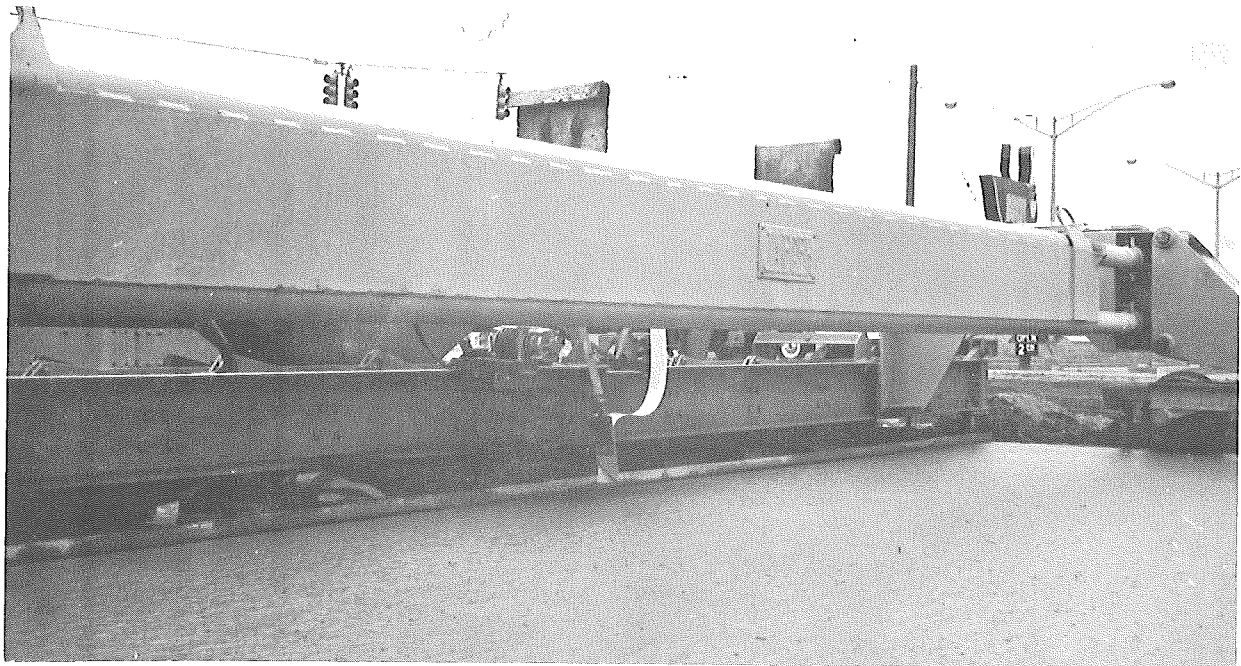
Location of polyethylene center strip installation device on rear of finishing machine.
